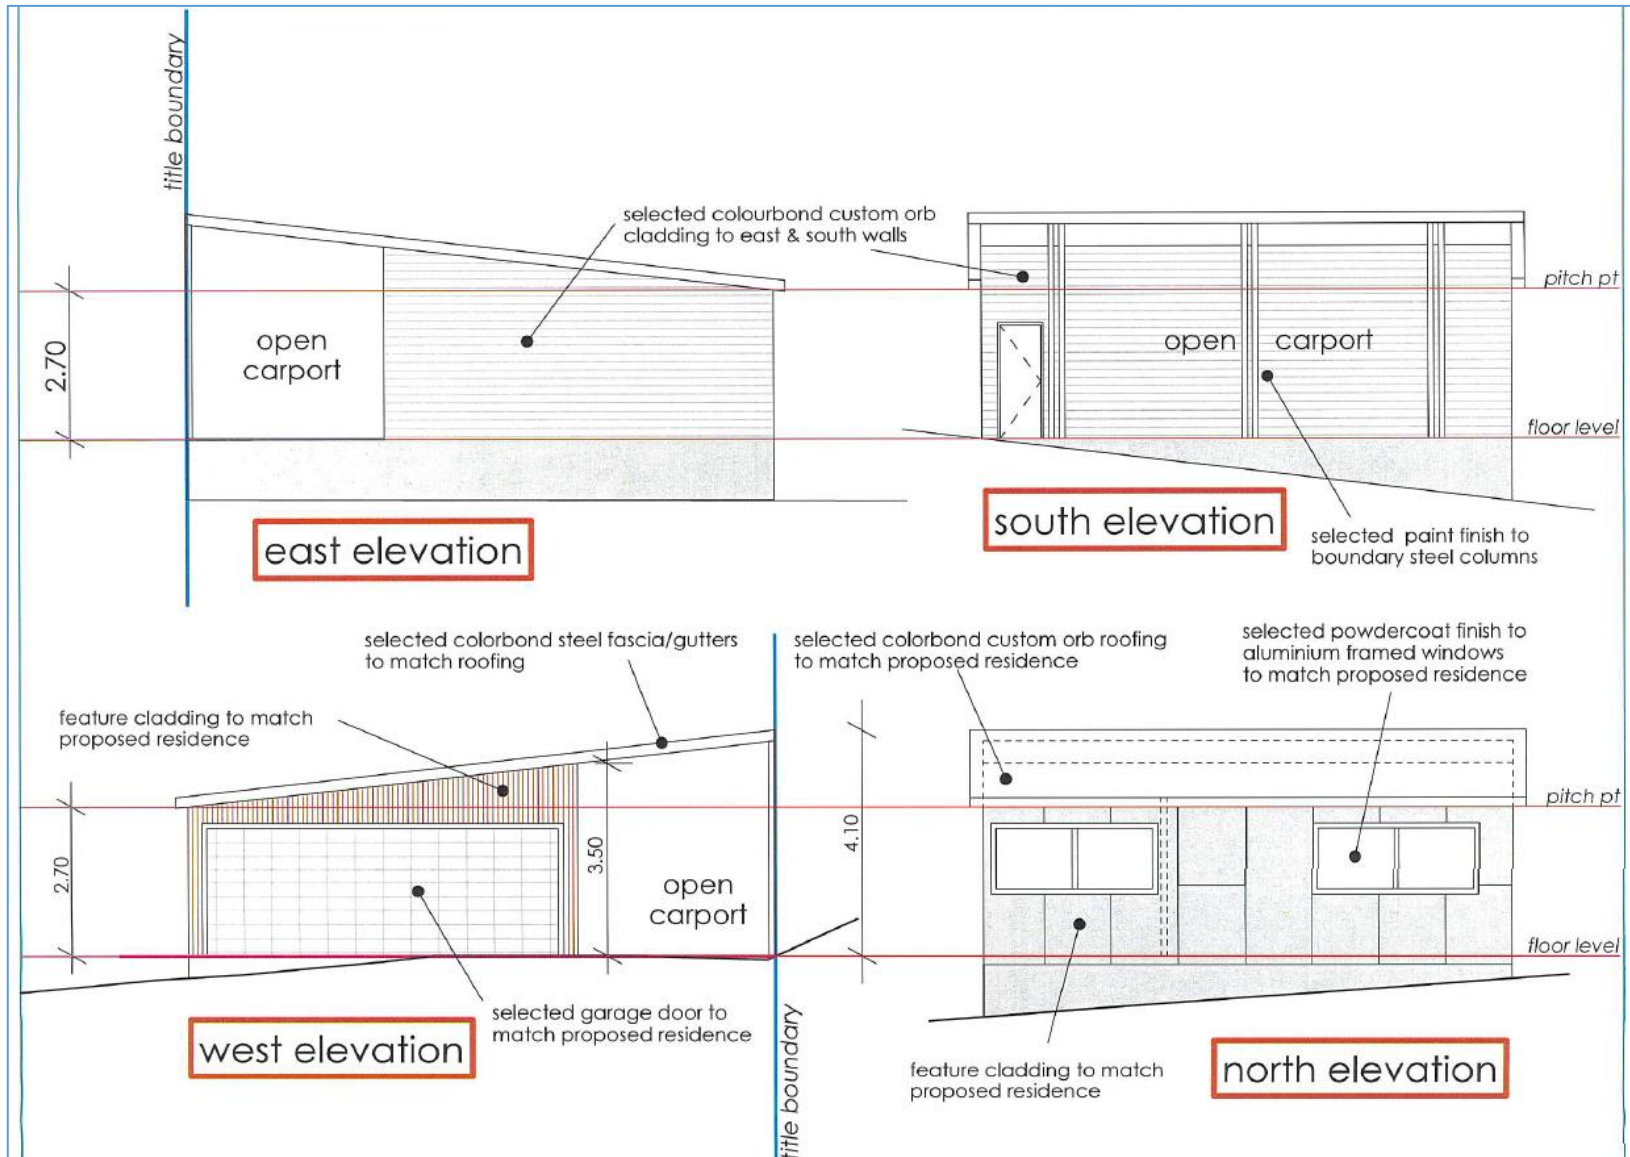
Elevation Plans of Proposed Shed within 64 Walter Street Bridport
